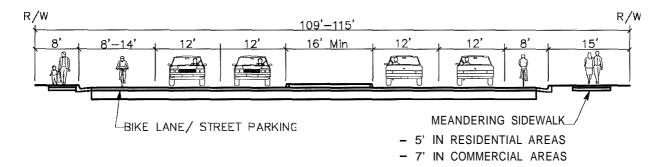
Segment 3 - Ultimate Roadway with Bicycle Lanes and Street Parking On North (Looking East)
